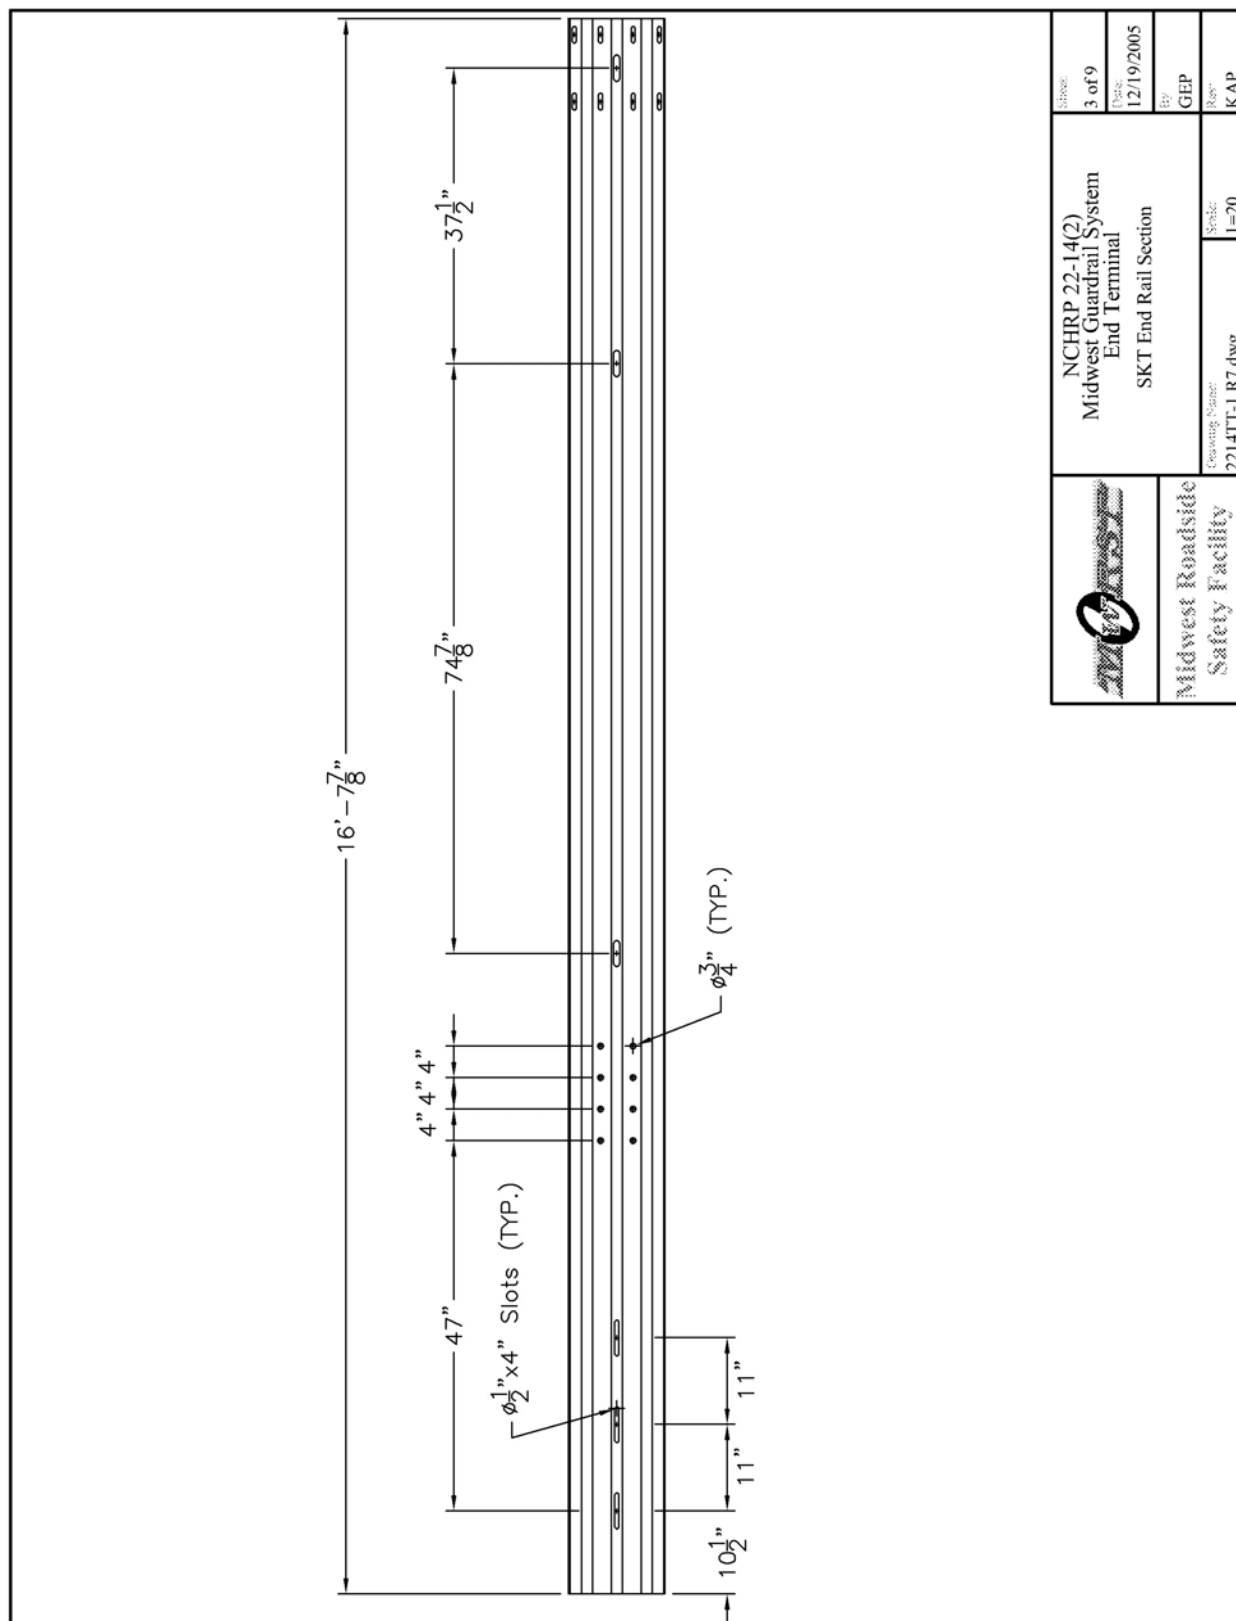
Midwest Guardrail System End Terminal - SKT End Rail Details (English)
